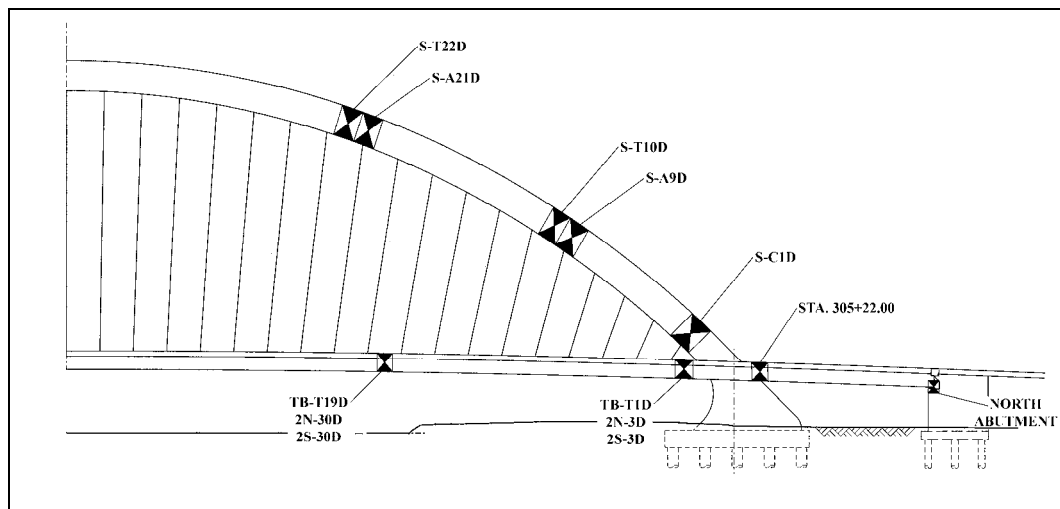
North Data Logger Locations (Modified IRIB Specifications and Construction Plans)
